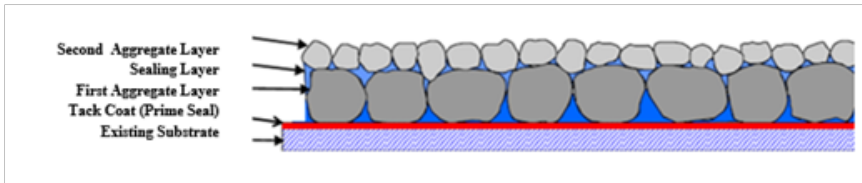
Sandwich type chip sealed road pavement cross-section (SANRAL 2007)
